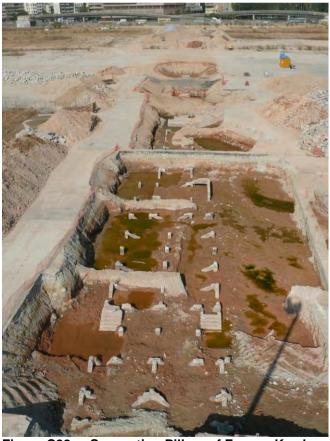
Supporting Pillars of Former Kowloon City Pier (View form south)
